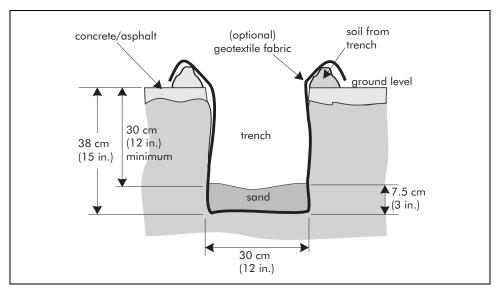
Thin, non-reinforced concrete/asphalt trench with optional geotextile fabric
